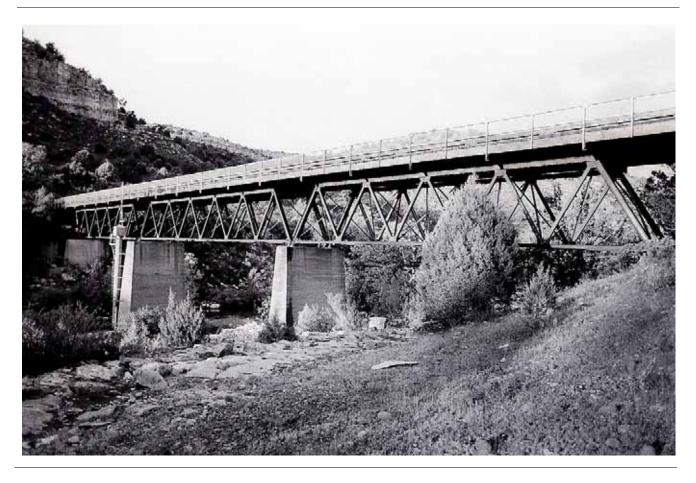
Black River Bridge, 2002 (note: trusses shown are replacement spans, erected in 1929 over original concrete piers).
